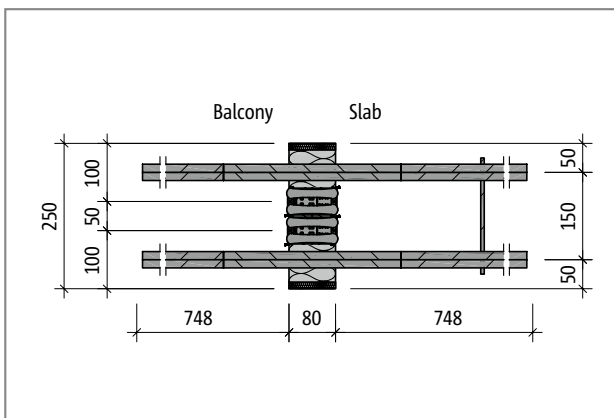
Schöck Isokorb® T type Q-E-VV7: Product layout
